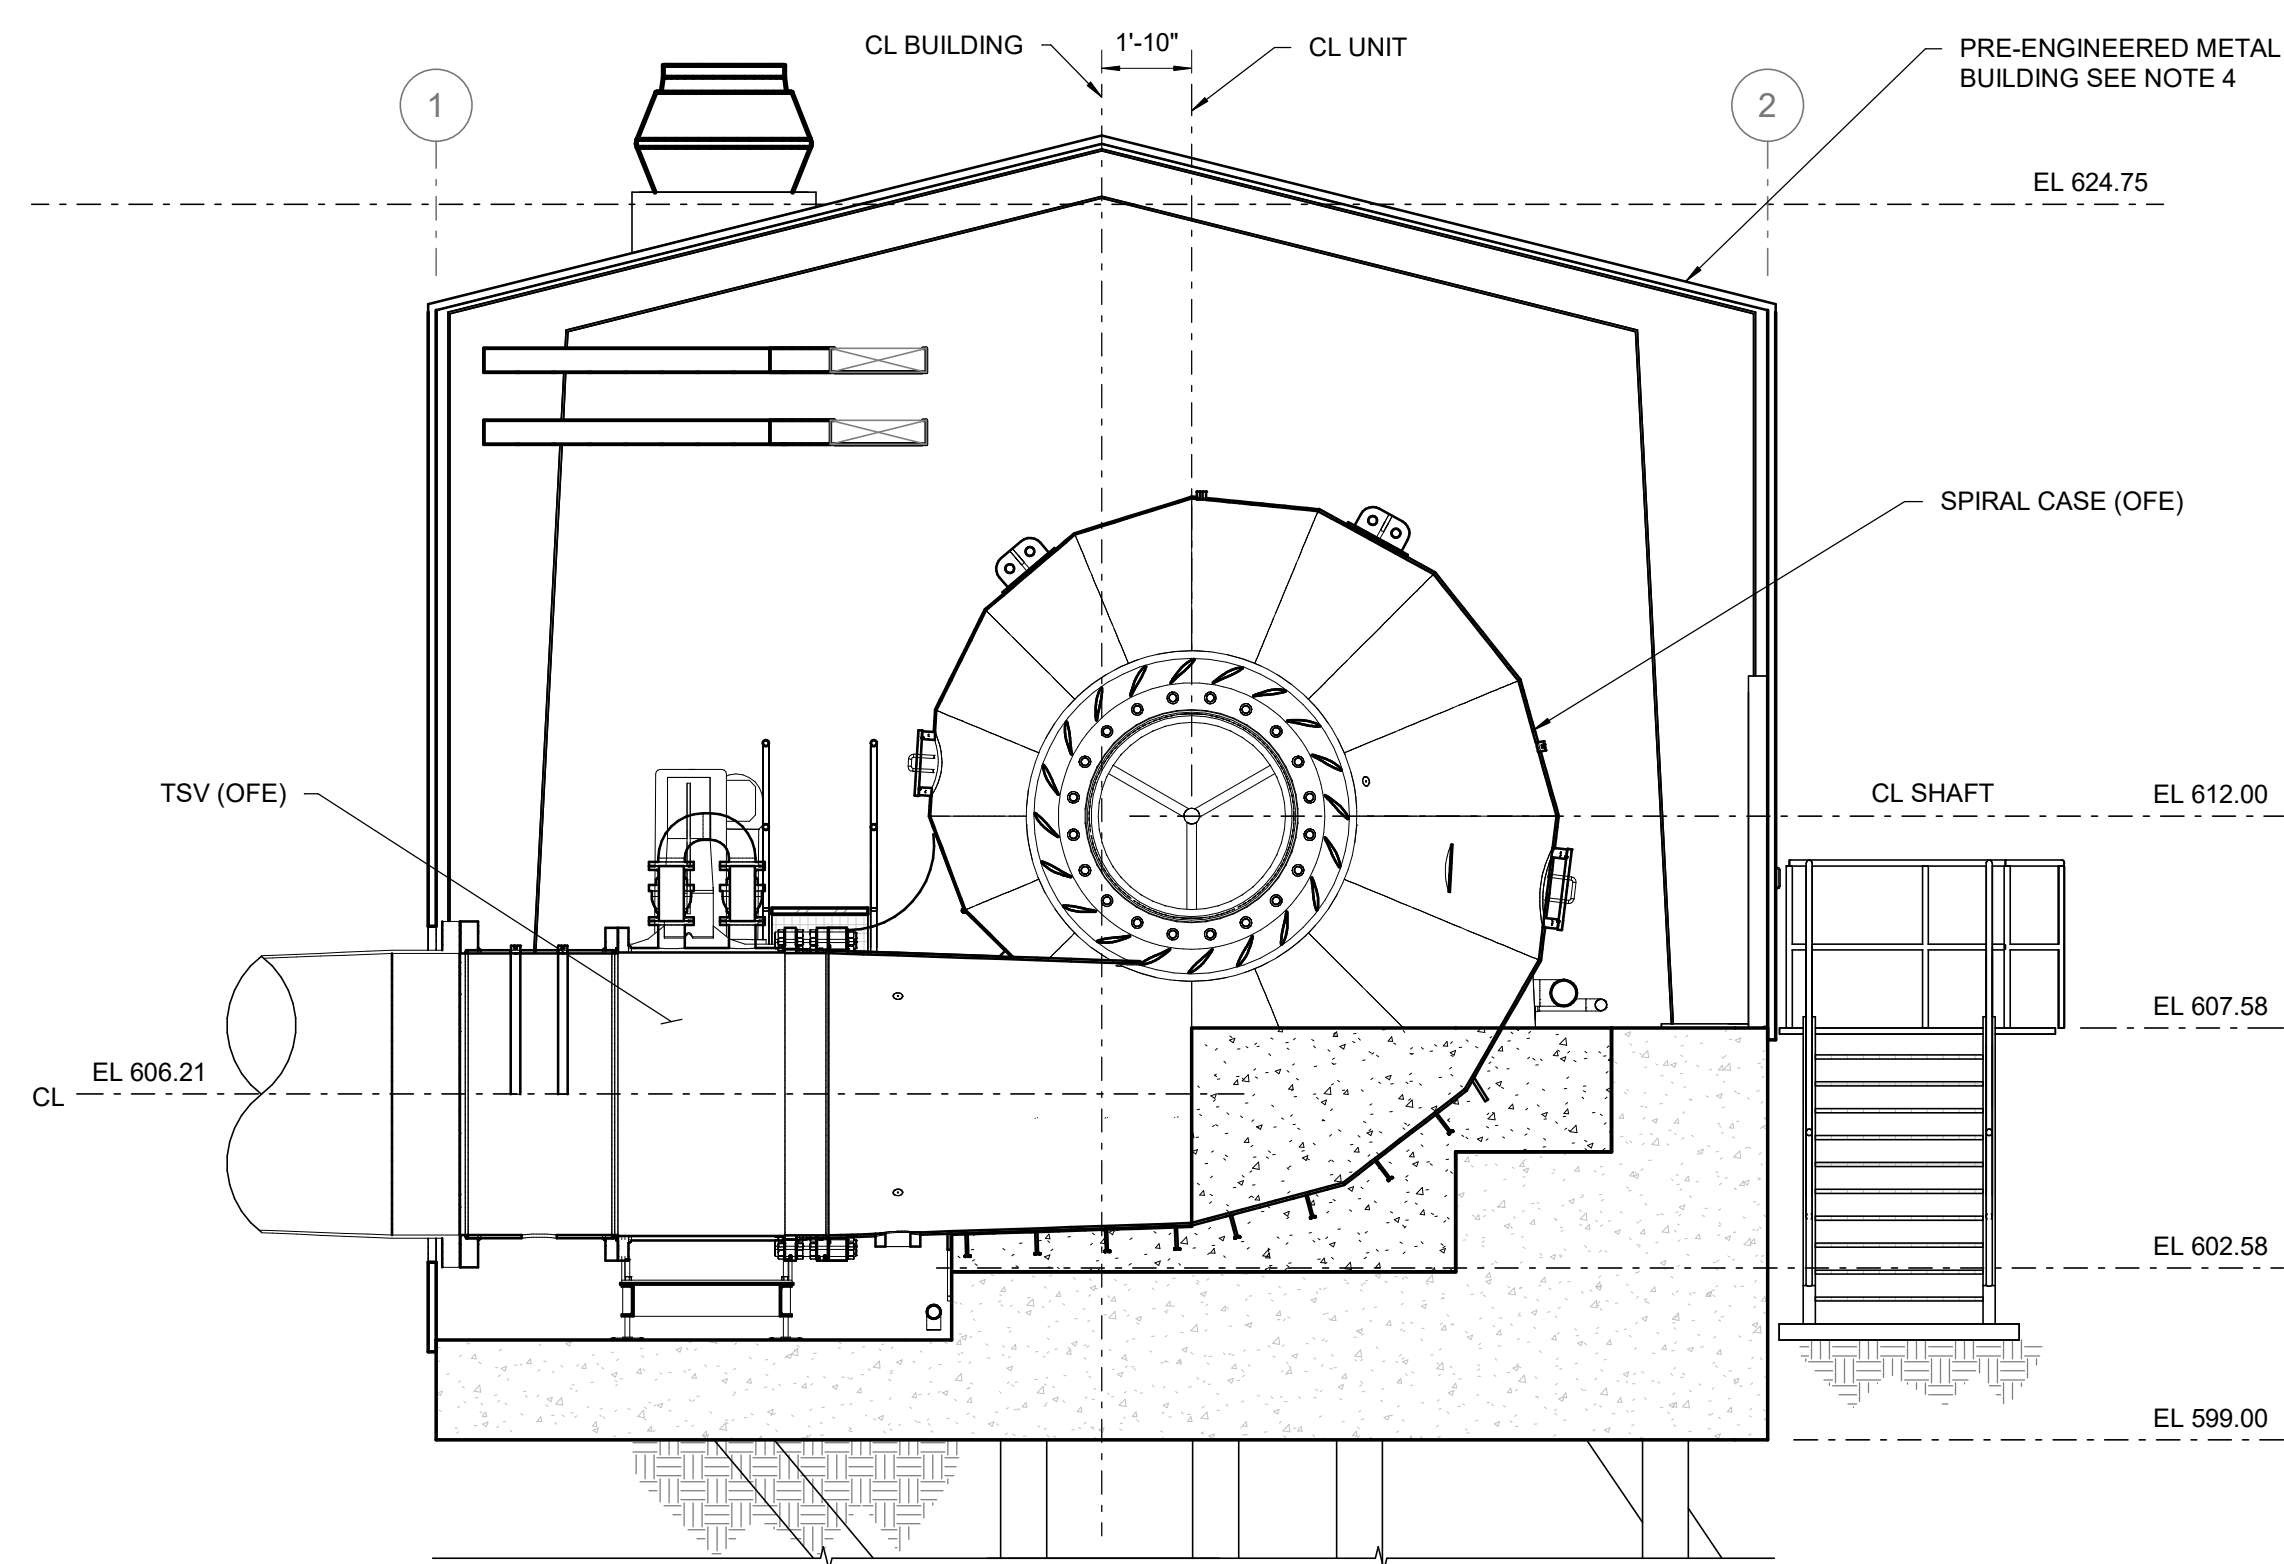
PLT-LYT-1006 - 005 Sheet 005 Revision 00
